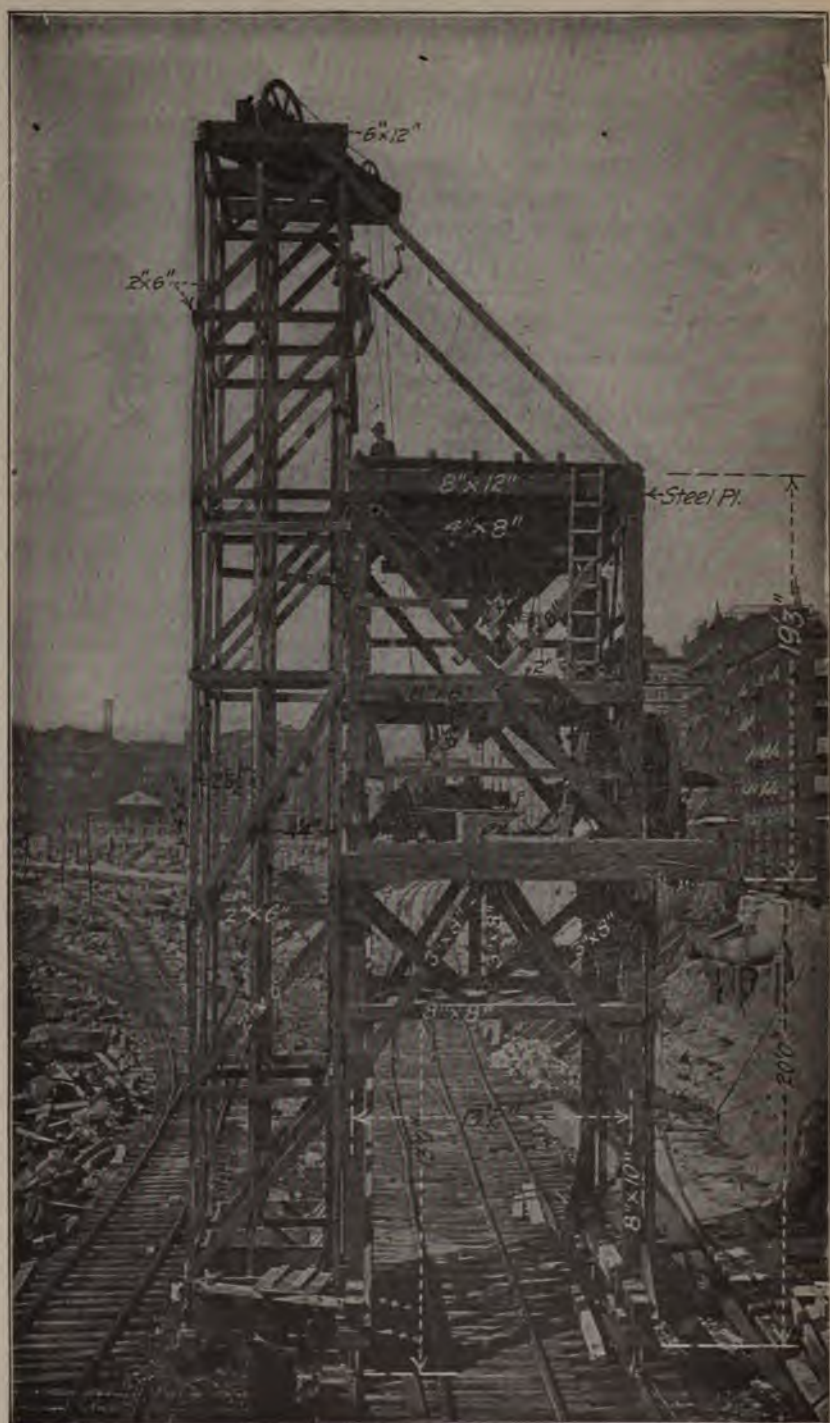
Concrete Mixing Plant, New York Central Terminal Work.
